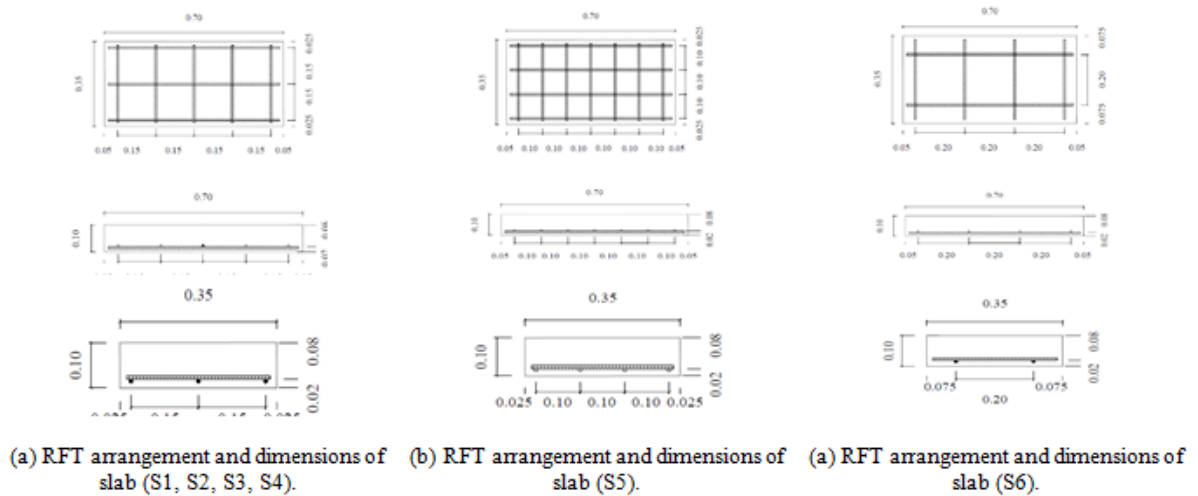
RFT arrangement and dimensions of slab (S1 to S6).
